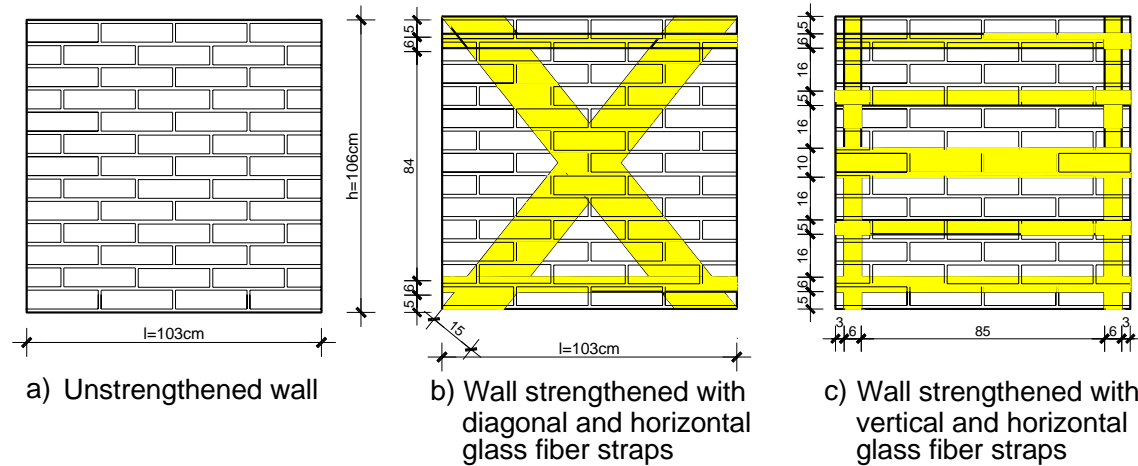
Shape and dimensions of masonry walls and glass fiber straps for specimens subjected to constant vertical compressive and variable horizontal loading
